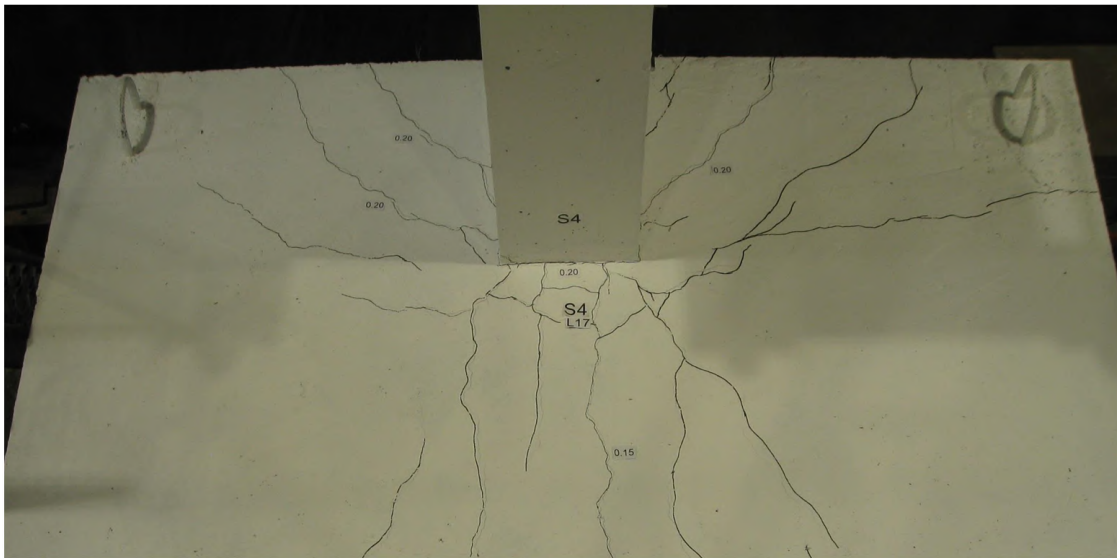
Specimen 4 slab cracks at $V = 186.0$ kN
